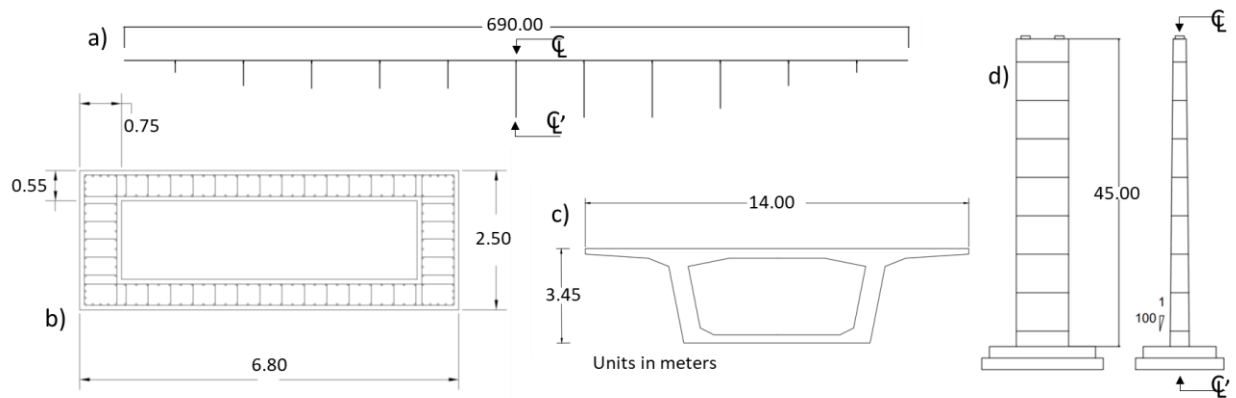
Bridge a) elevation layout; b) deck reinforcement; c) pier cross-section; and d) example pier side views (the pier at the centreline).
